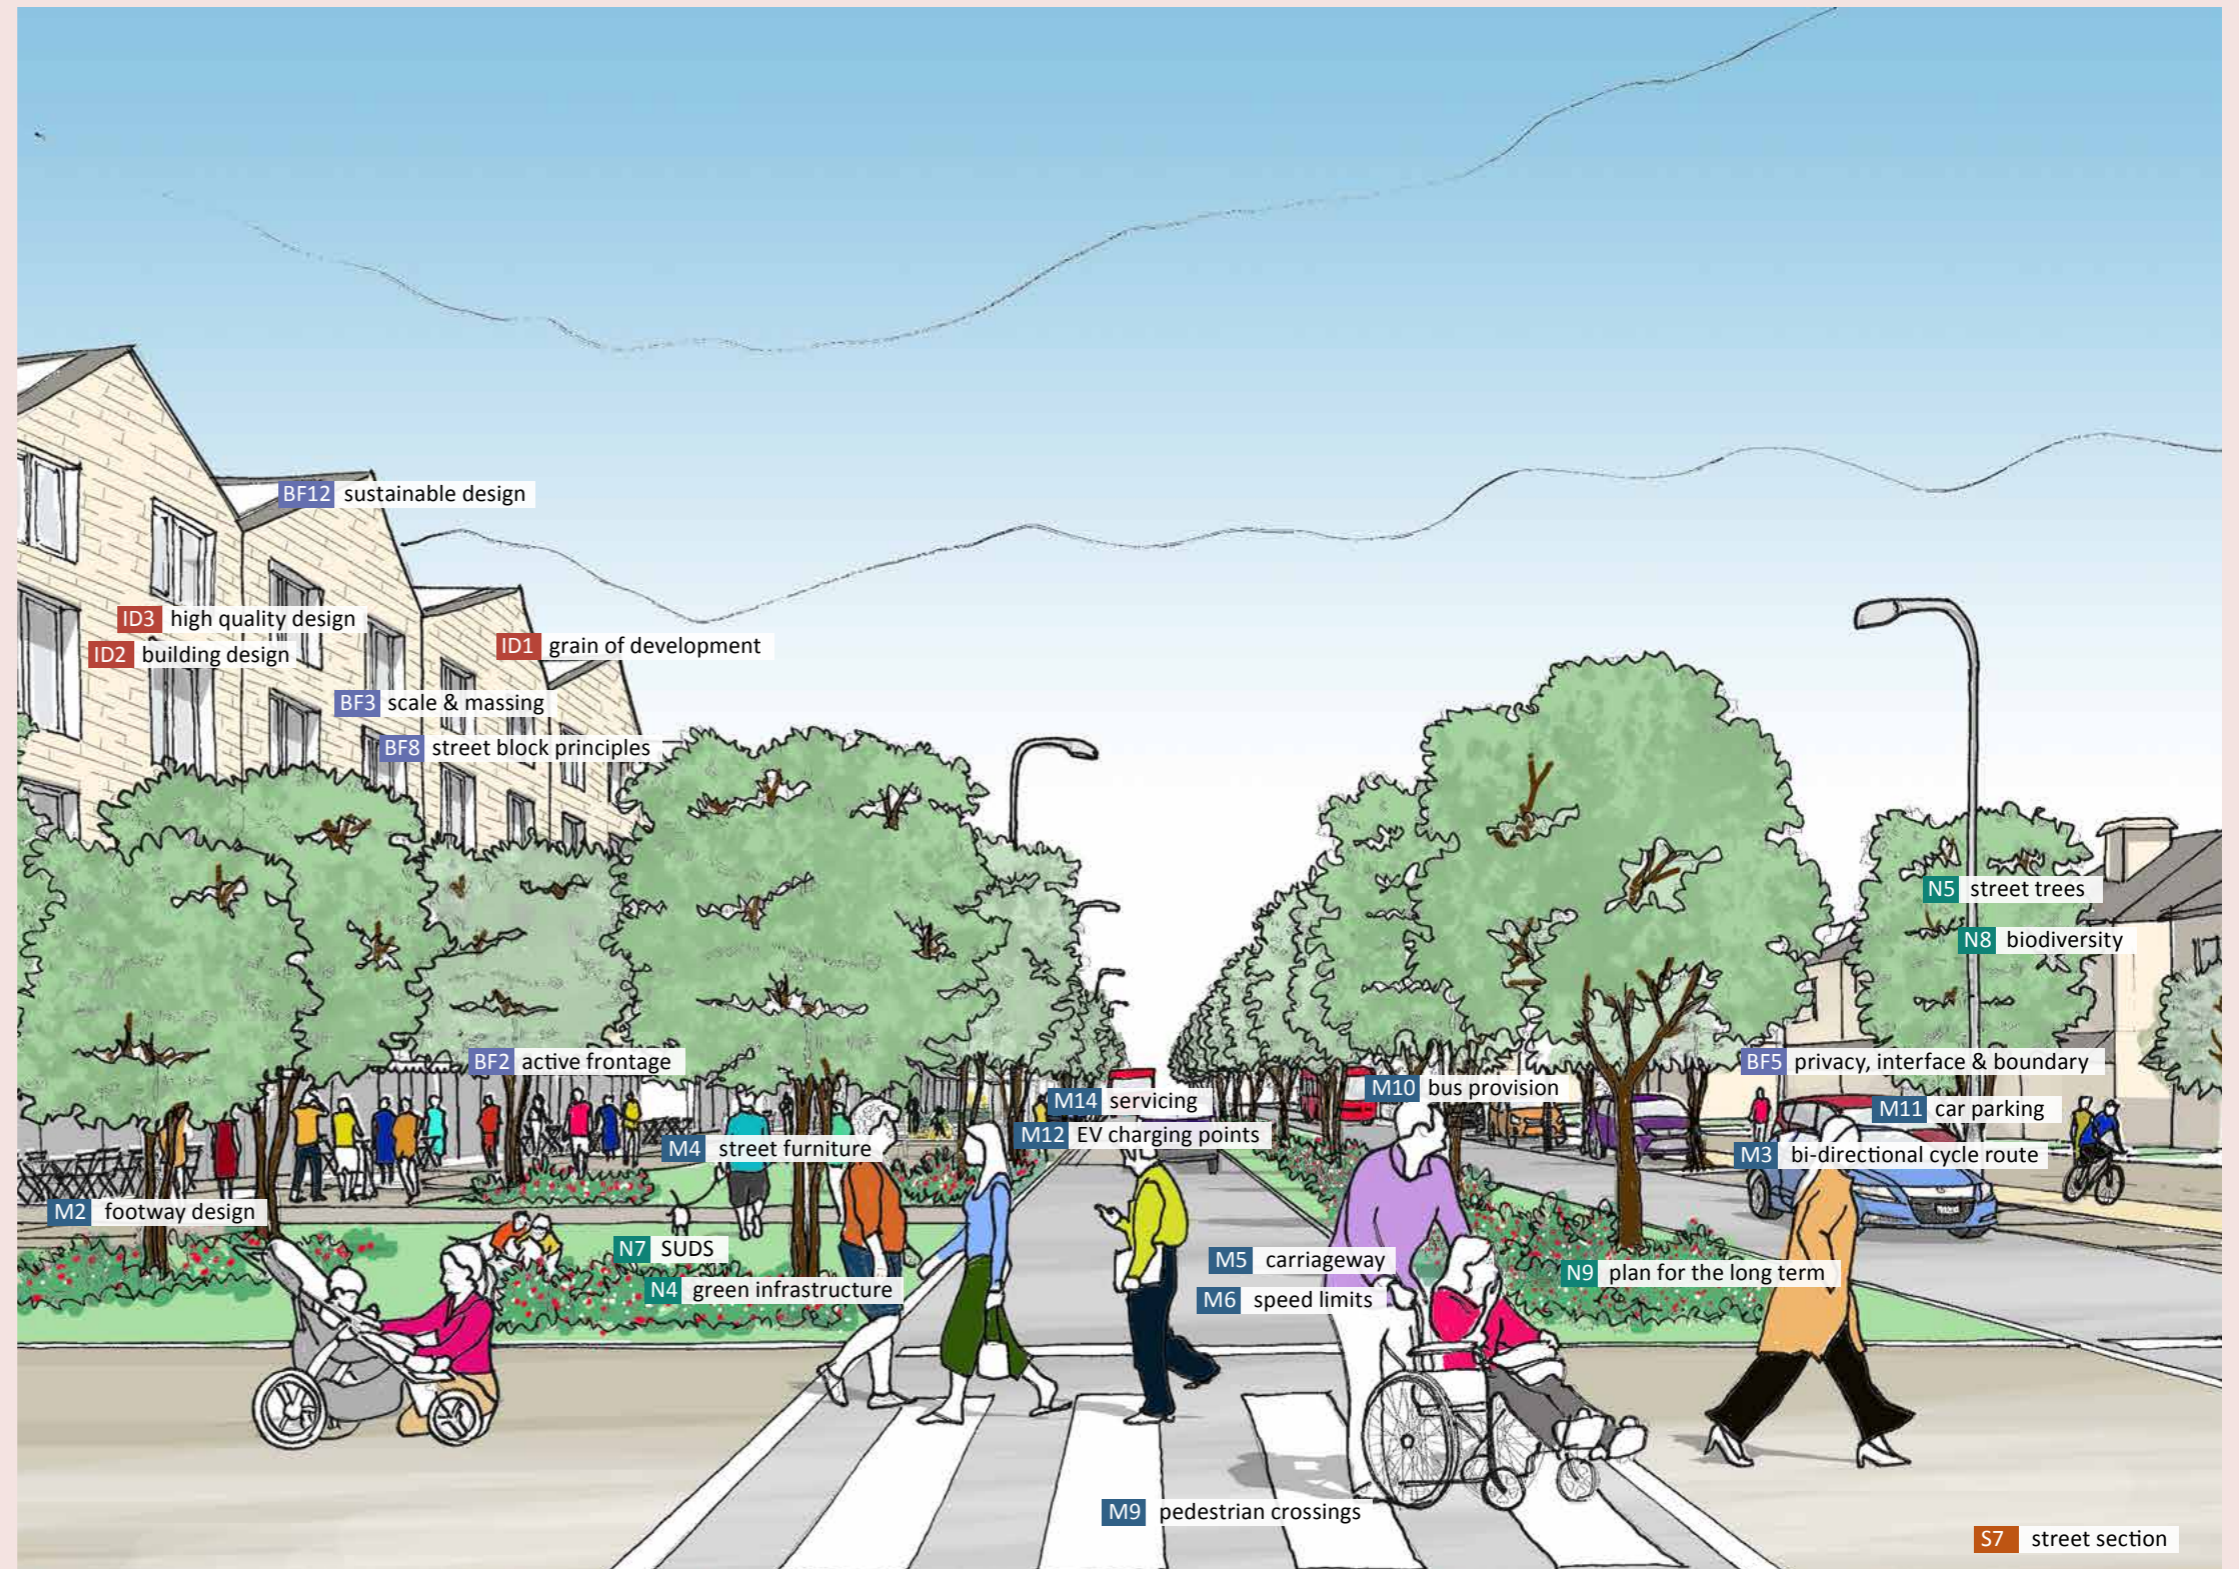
Sketch indicating application of the code on the A23 on Brighton Road in Salfords including reducing carriageway widths, introducing car parking parallel to the street and providing a more attractive public realm setting for shops and services in the local centre.
